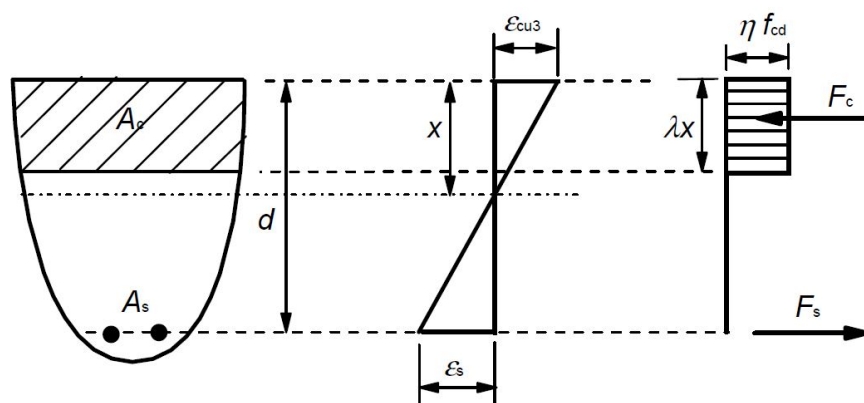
Example of a reinforced concrete section loaded in bending. Source: NEN-EN 1992-1-1, section 3.1.7 [19]
